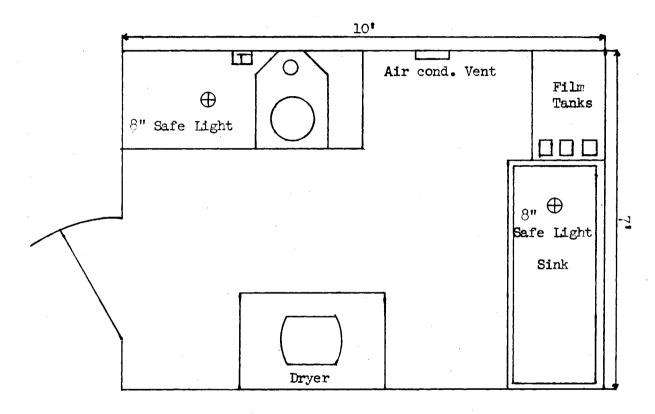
DARKROOM FLOOR PLAN - STILLWATER DAILY NEWS-PRESS. (SCALE 1/2" = 1")
